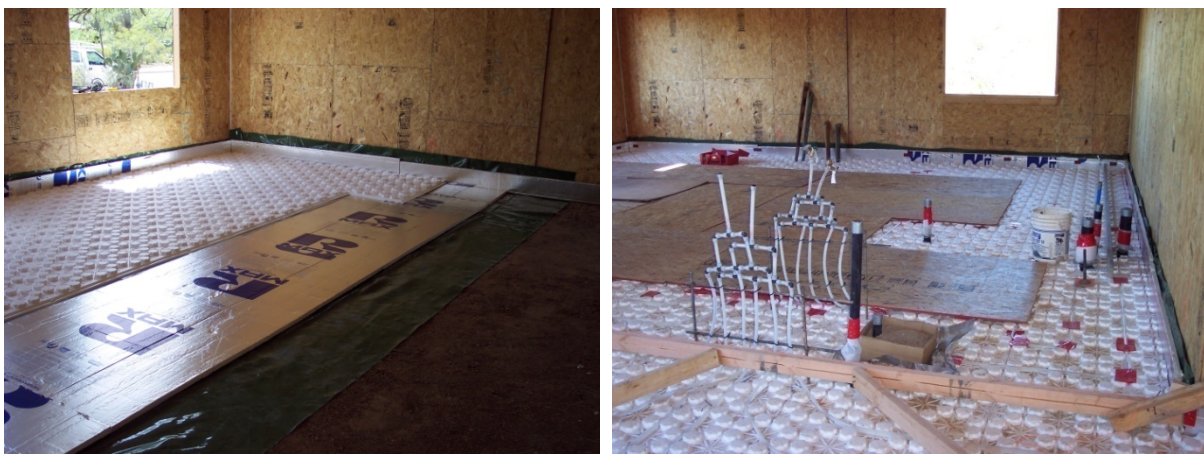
Insulation installed below slab (left) and PEX tubing laid out for radiant heating and cooling delivery (right)
